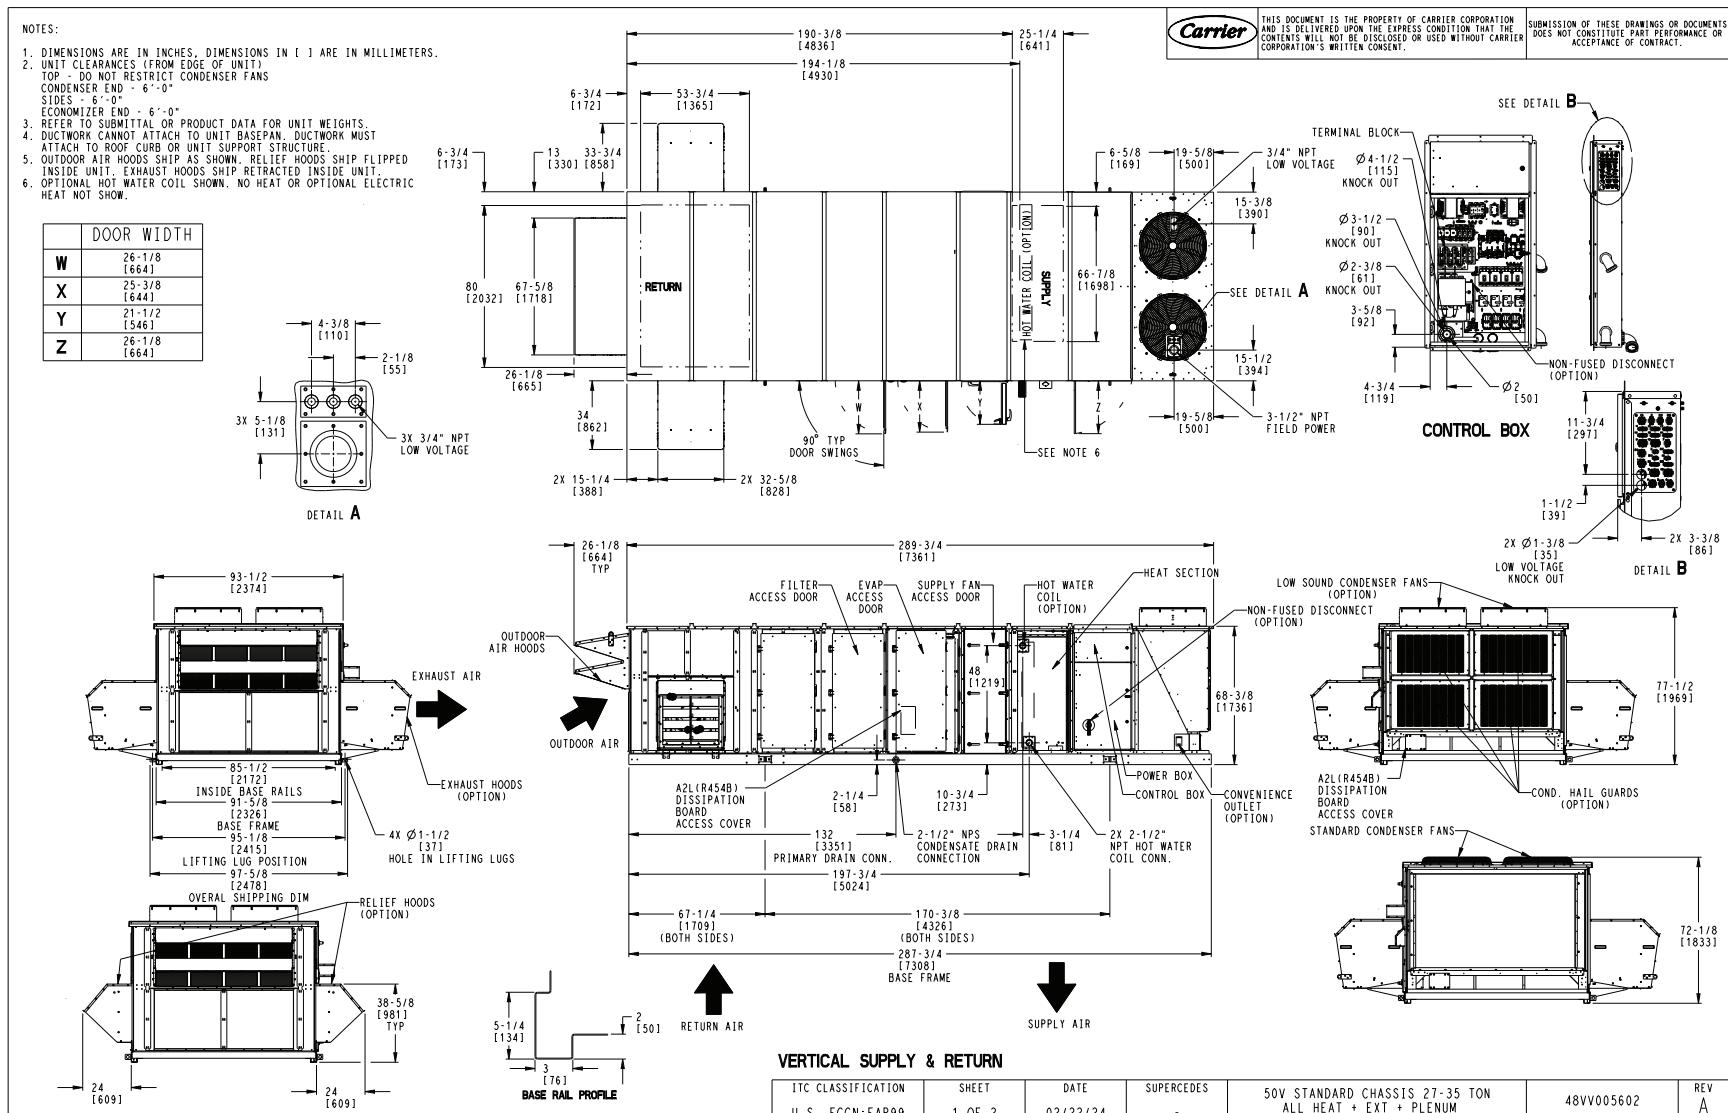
50V 27.5-35 Ton Extended Standard Chassis with Plenum Section
